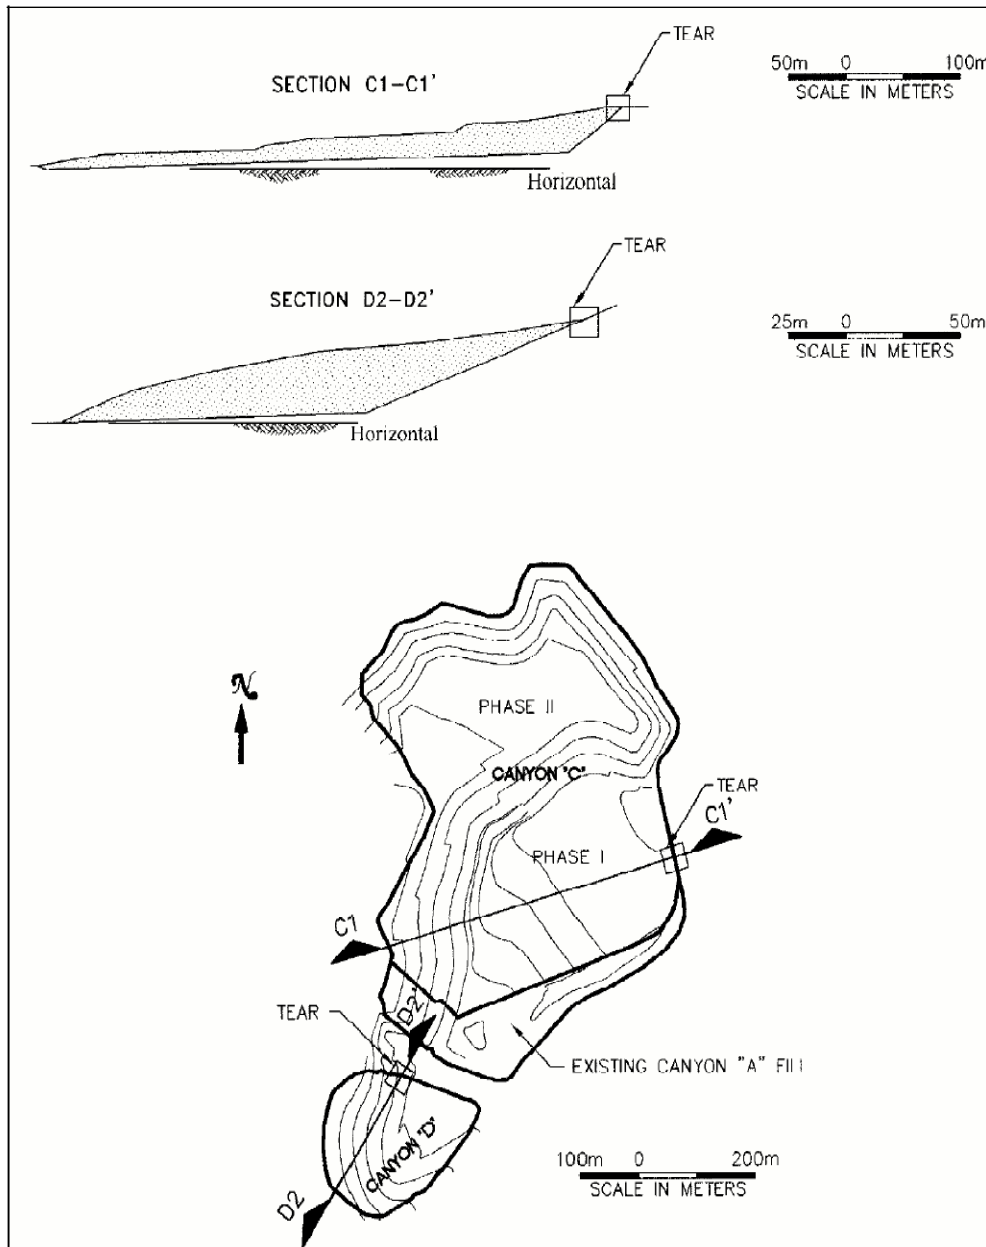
Plan view and cross sections through the Chiquita Canyon landfill (Augello et al. 1995).
